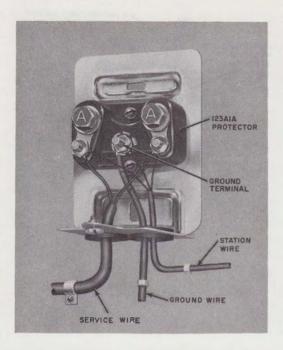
123A1A Protector Installed in 305A2 Protector Mounting
